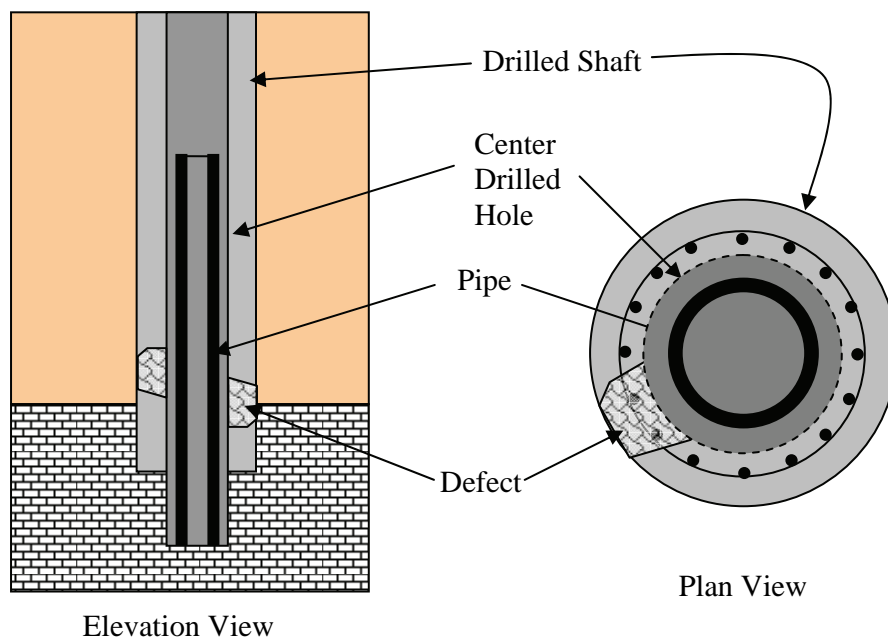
Use of a Steel Section Cast into a Drilled Shaft to Form Structural Bridge
